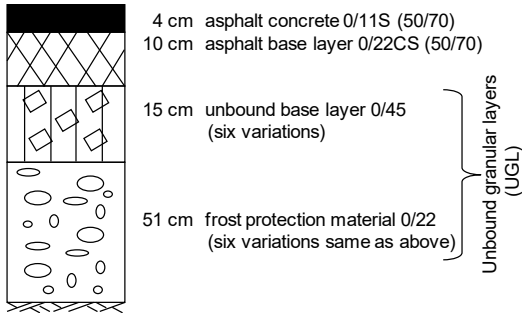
Pavement construction according to RStO 01, construction class IV, for all test subsections
